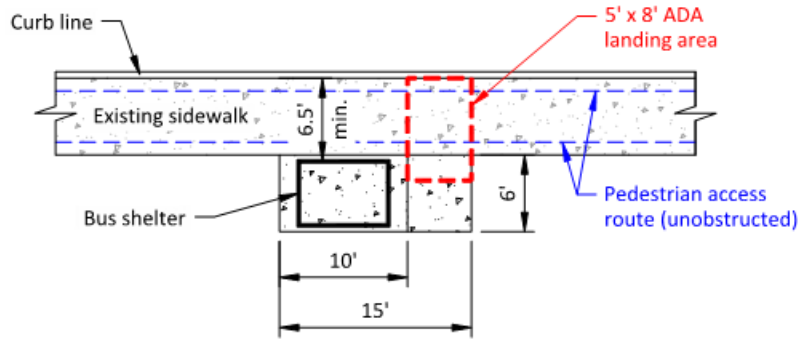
Separated Sidewalk with Rear Door Landing Area
